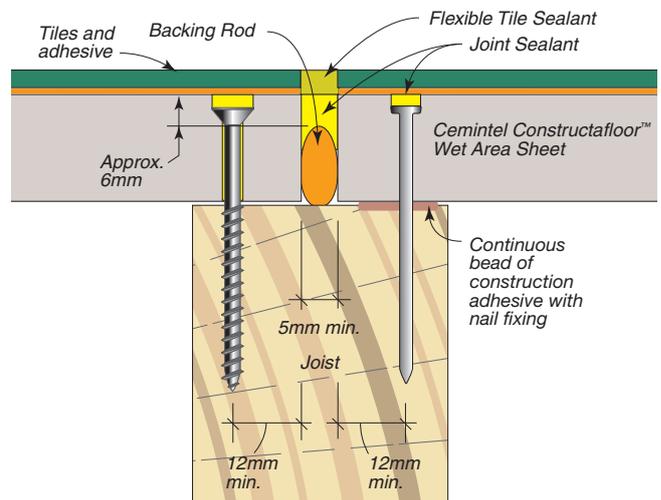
Typical T&G Joint with Direct Fixed Tiles
